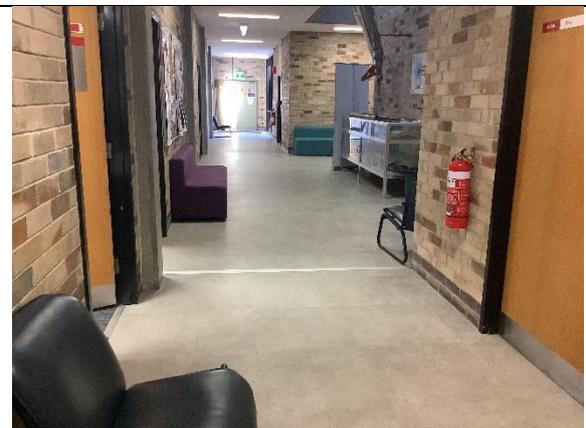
Building G – G.1.1-32,33 – Throughout – Floor Covering – Vinyl Tiles - Grey
